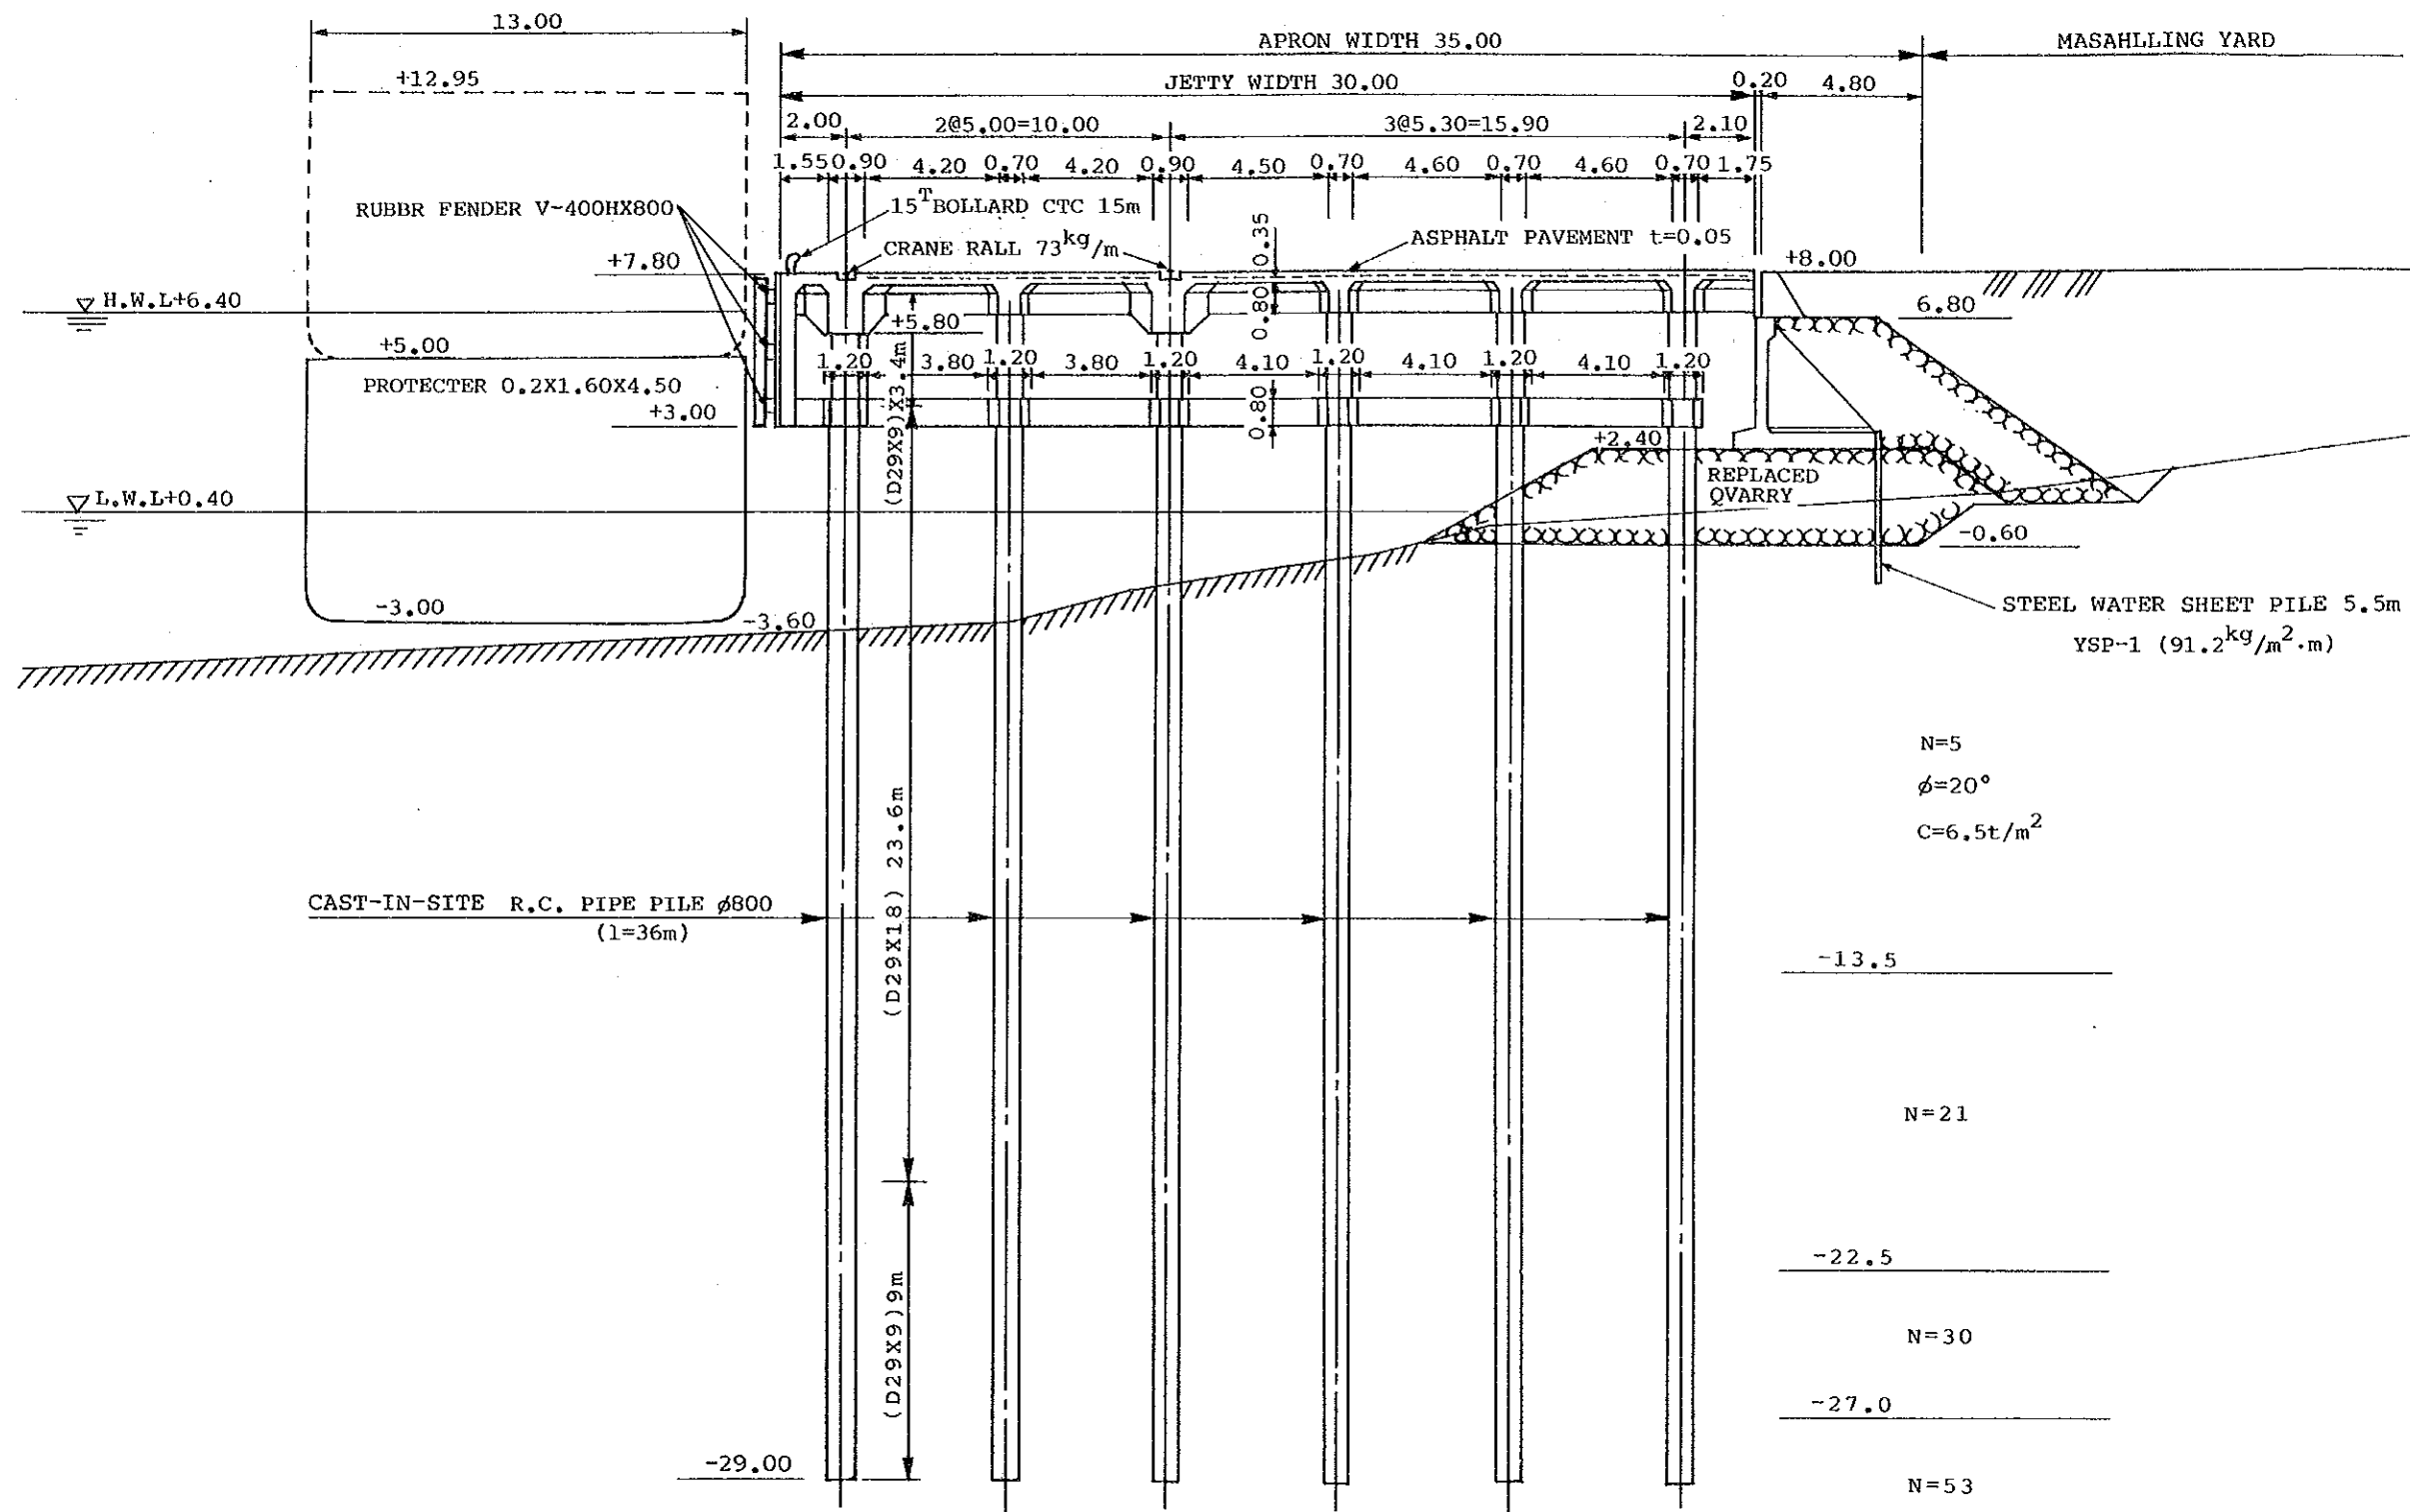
(1) Typical Cross Section of Open Type Wharf with Vertical Piles
